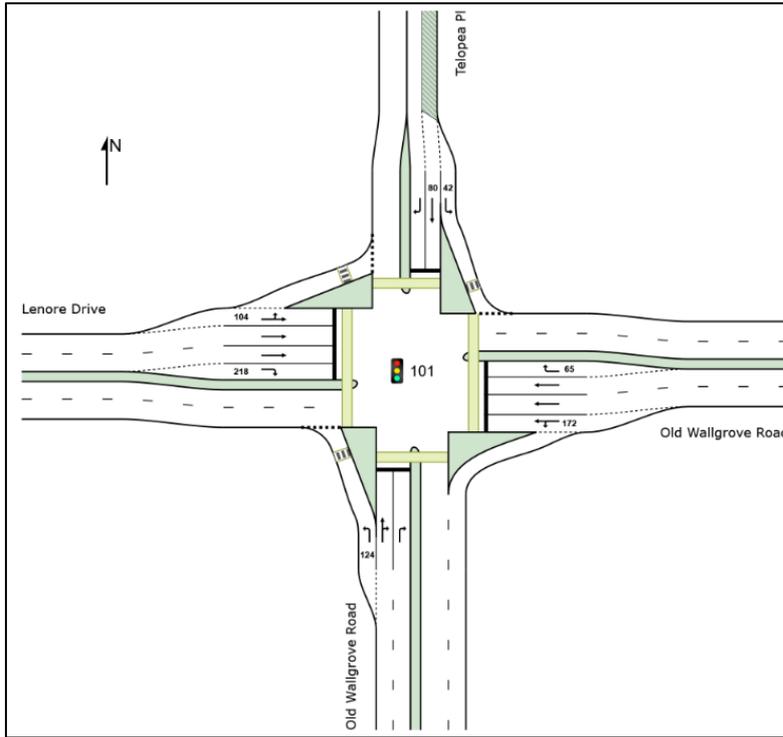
SIDRA Existing Intersection Layout – Old Wallgrove Rd / Lenore Dr / Telopea PI
